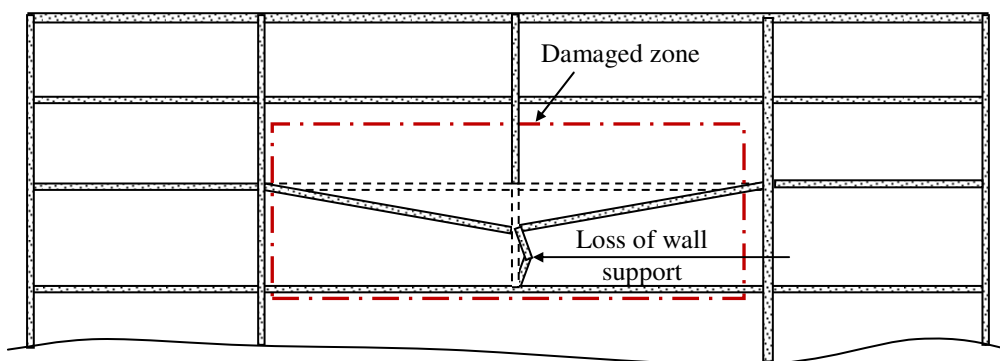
Section view of a precast cross wall building subjected to the wall damage
